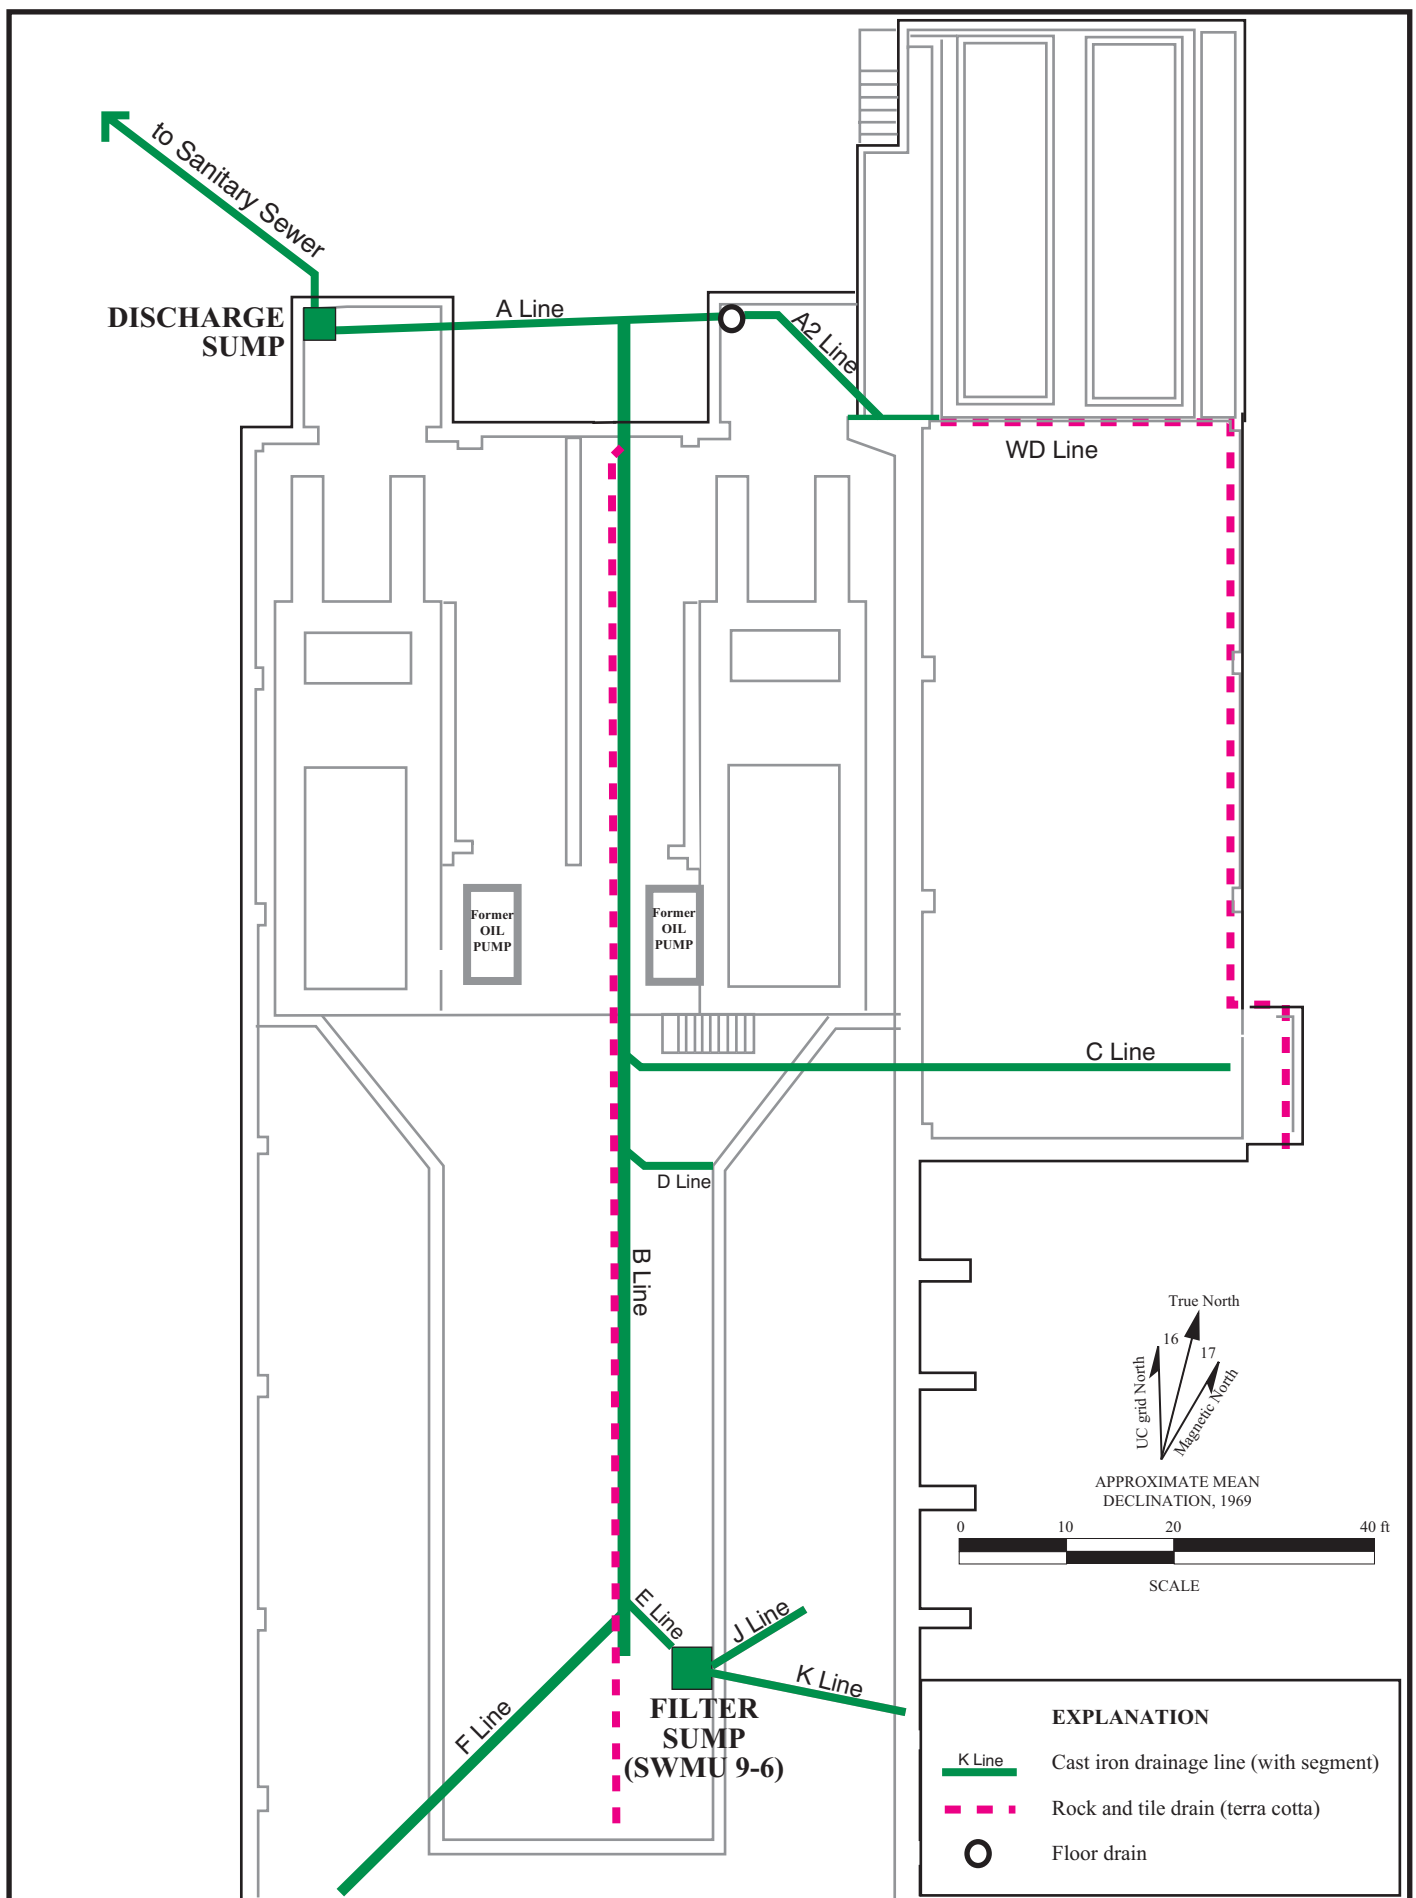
Plan View of Building 51 Motor Generator Room Basement Showing Location of Drainage Lines.
